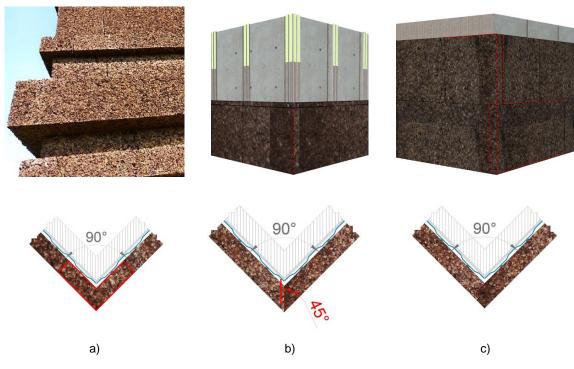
Corner connections: a) Special one-piece corner ICB; b) ICB half lap boards cut at 45° and c) Staggered ICB.
